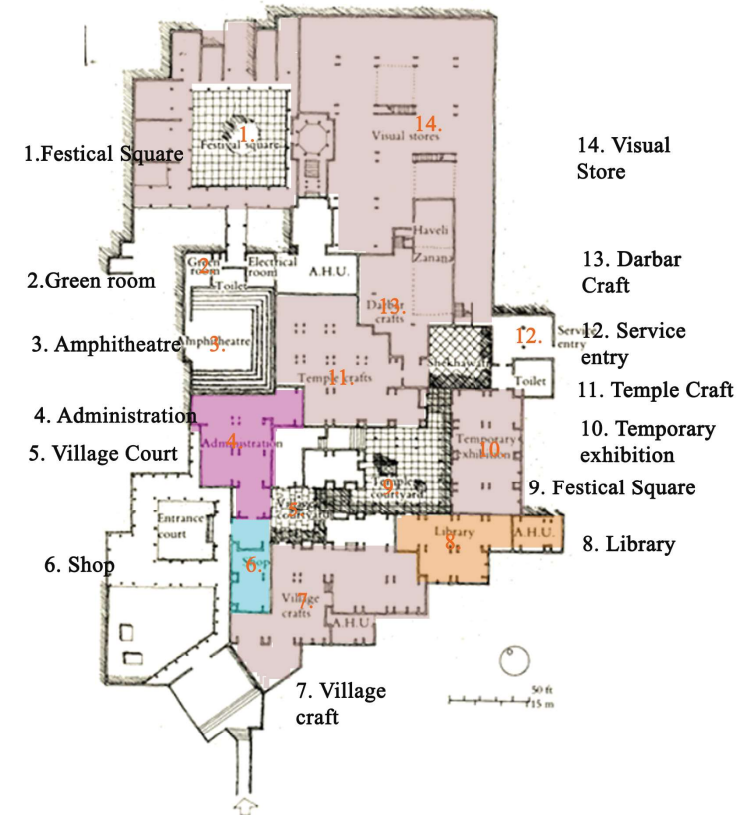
Ground Floor Plan (Source: architecture-casestudies.wordpress.com)
